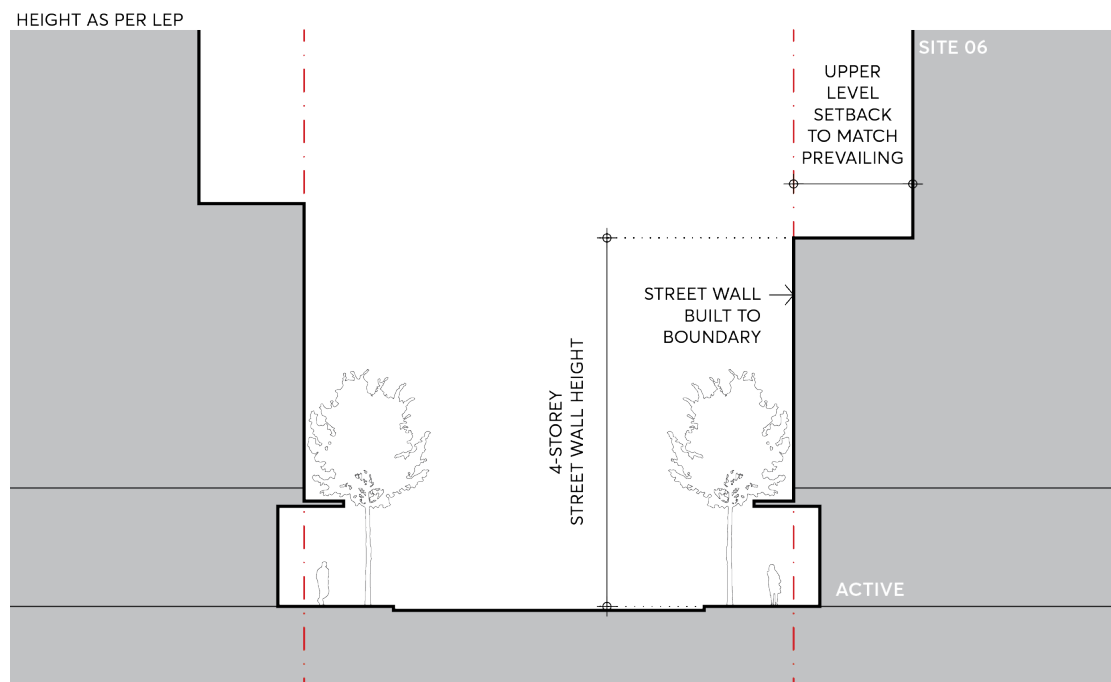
Cowper Street (Section C) Setbacks and Street Wall Height
